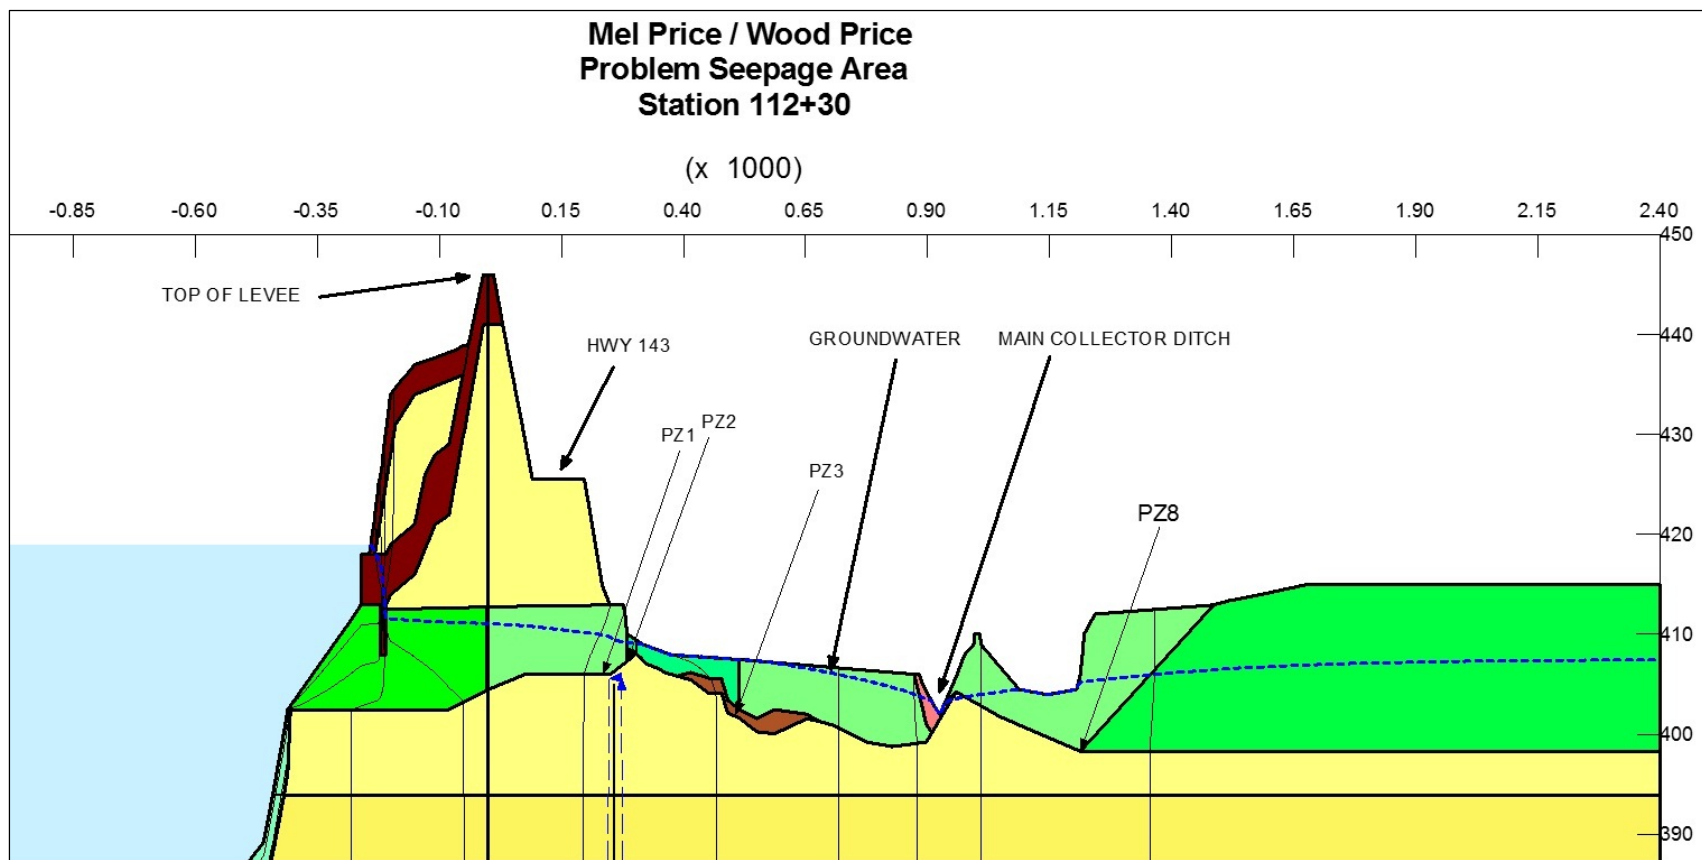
Modeled Groundwater Surface Elevation (dashed blue line) under Relief Well Plan (Tentatively Selected Plan) at Sta. 112+30.
